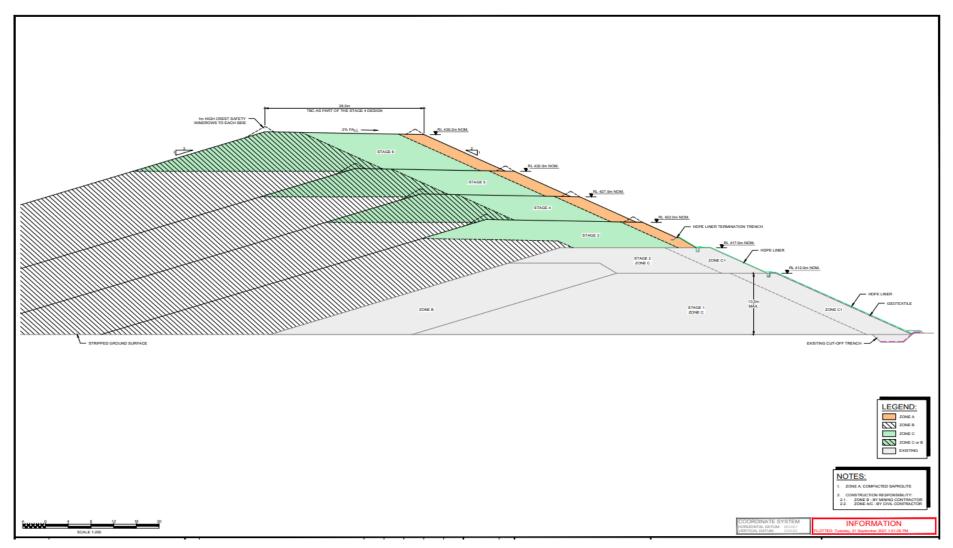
Existing Stage 1 and 2 and proposed Stages 3 - 6 embankment design
